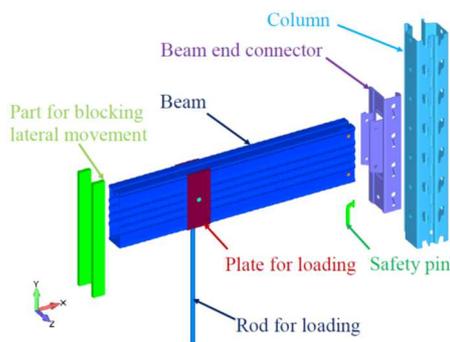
Model of cantilever test for beam to column connection of the joint S80M-R140L.
